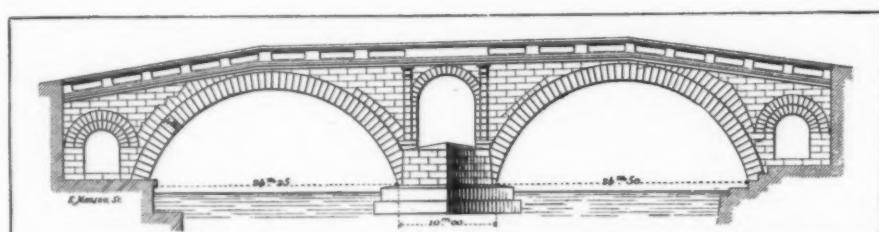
ELEVATION OF THE FABRICIUS BRIDGE.
